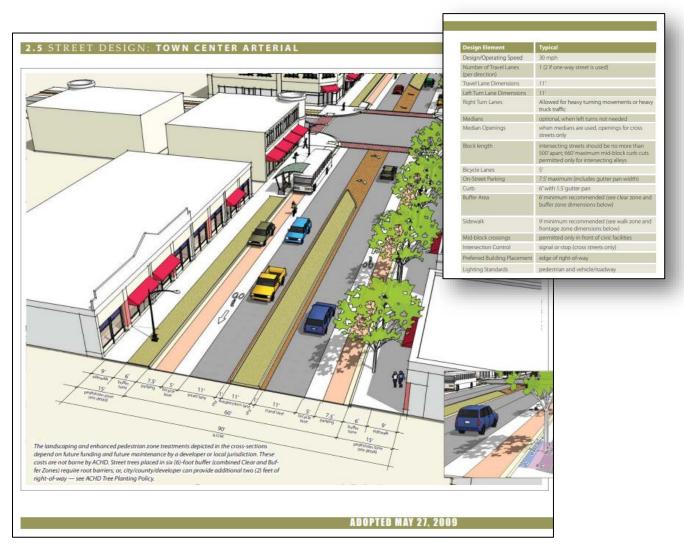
Town Center Arterial Rendering from the Ada County Highway District's Livable Street Design Guide Showing Multiple Modes on a Single Roadway
